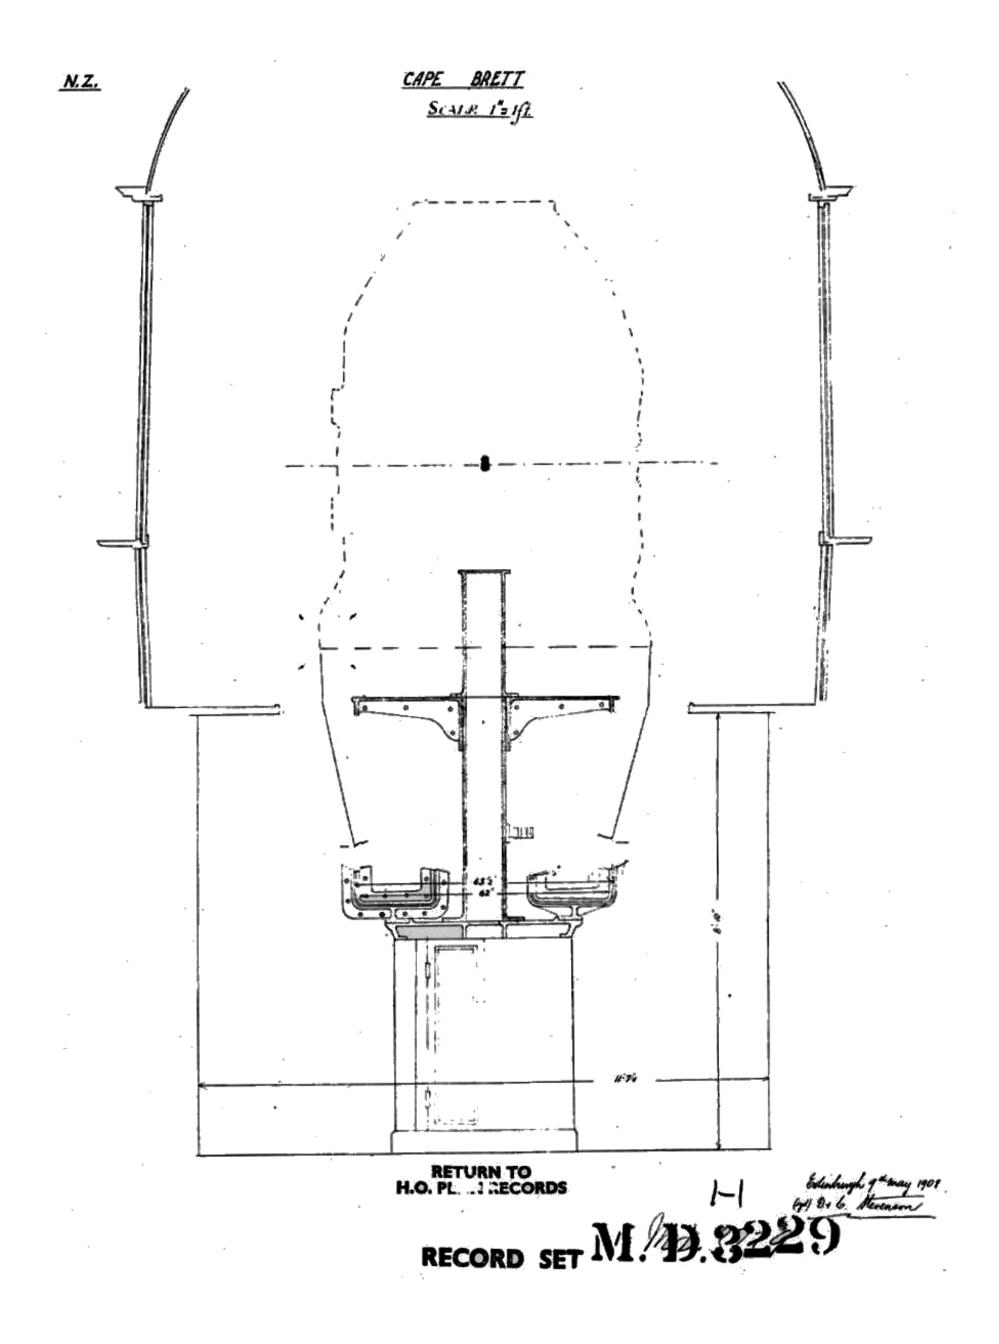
The architectural plans for the lighthouse –Drawing No 5.
